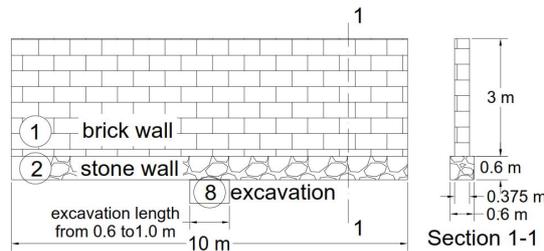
Detail of the excavation, with the wall and corresponding foundation.
